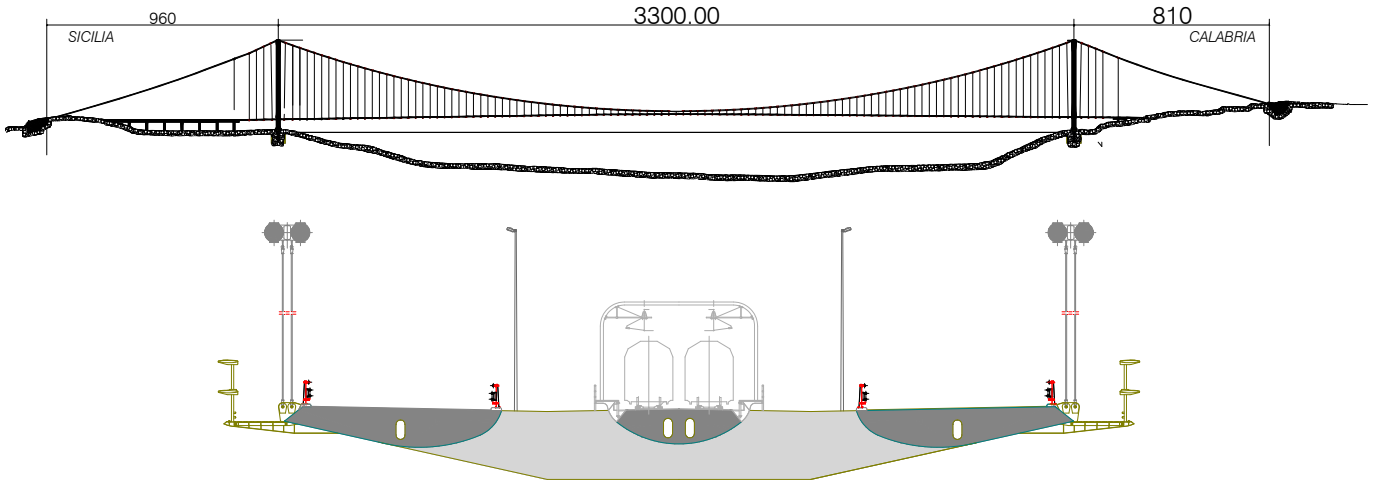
Messina bridge 3 300 m span road cum rail bridge.
